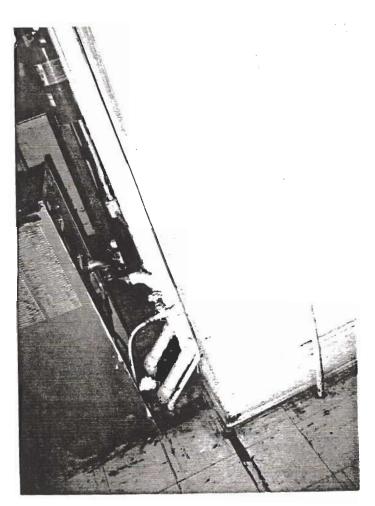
Second Floor Corridor: Water Damage to Floor.
